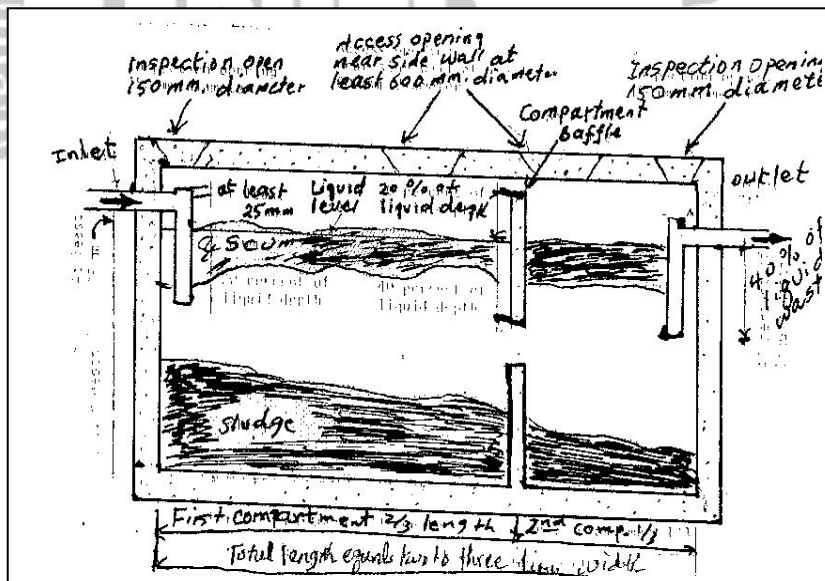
Septic Tank System with Inlet and out let Arrangement
